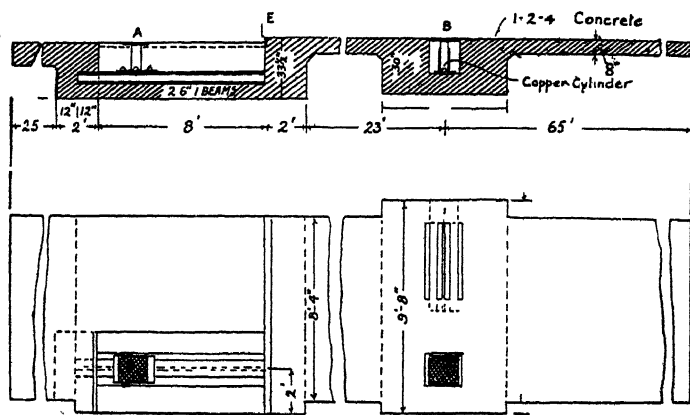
SECTION SHOWING SPECIAL CONCRETE ROAD CONSTRUCTION WITH APPARATUS FOR IMPACT TESTS. (U.S.A.)
